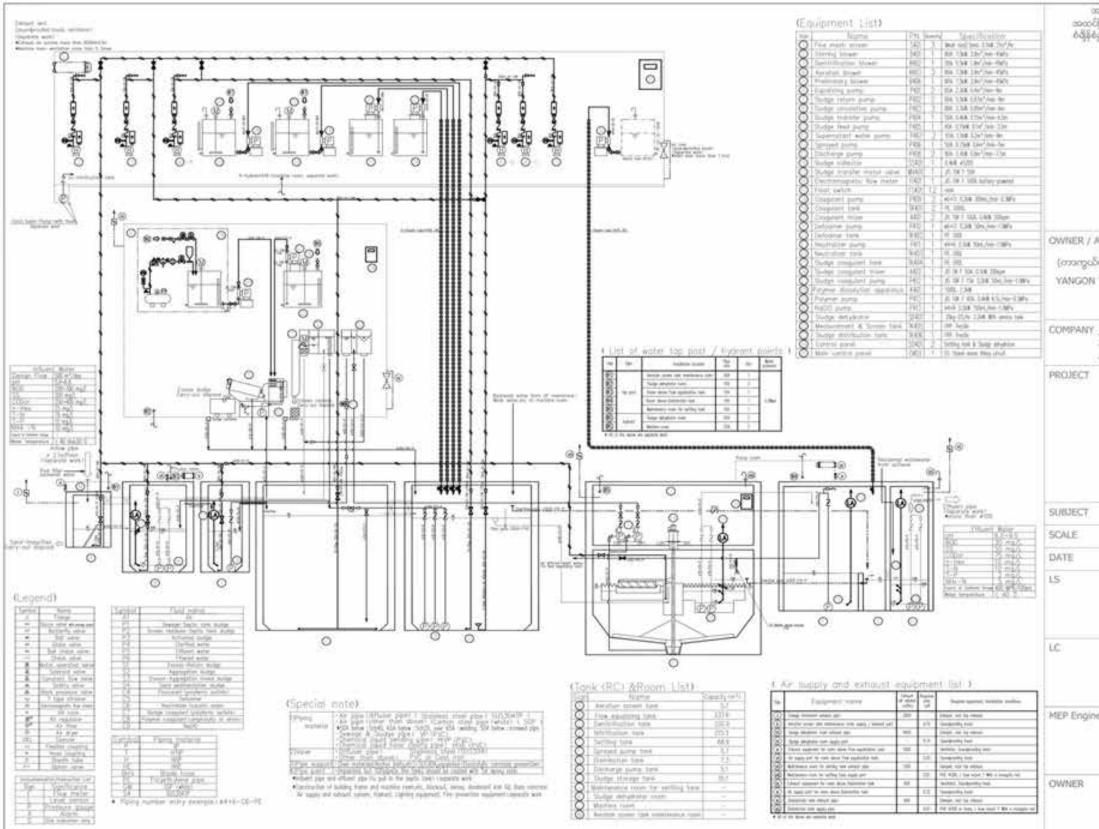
29 OJI Wastewater Treatment System Layout Plan
